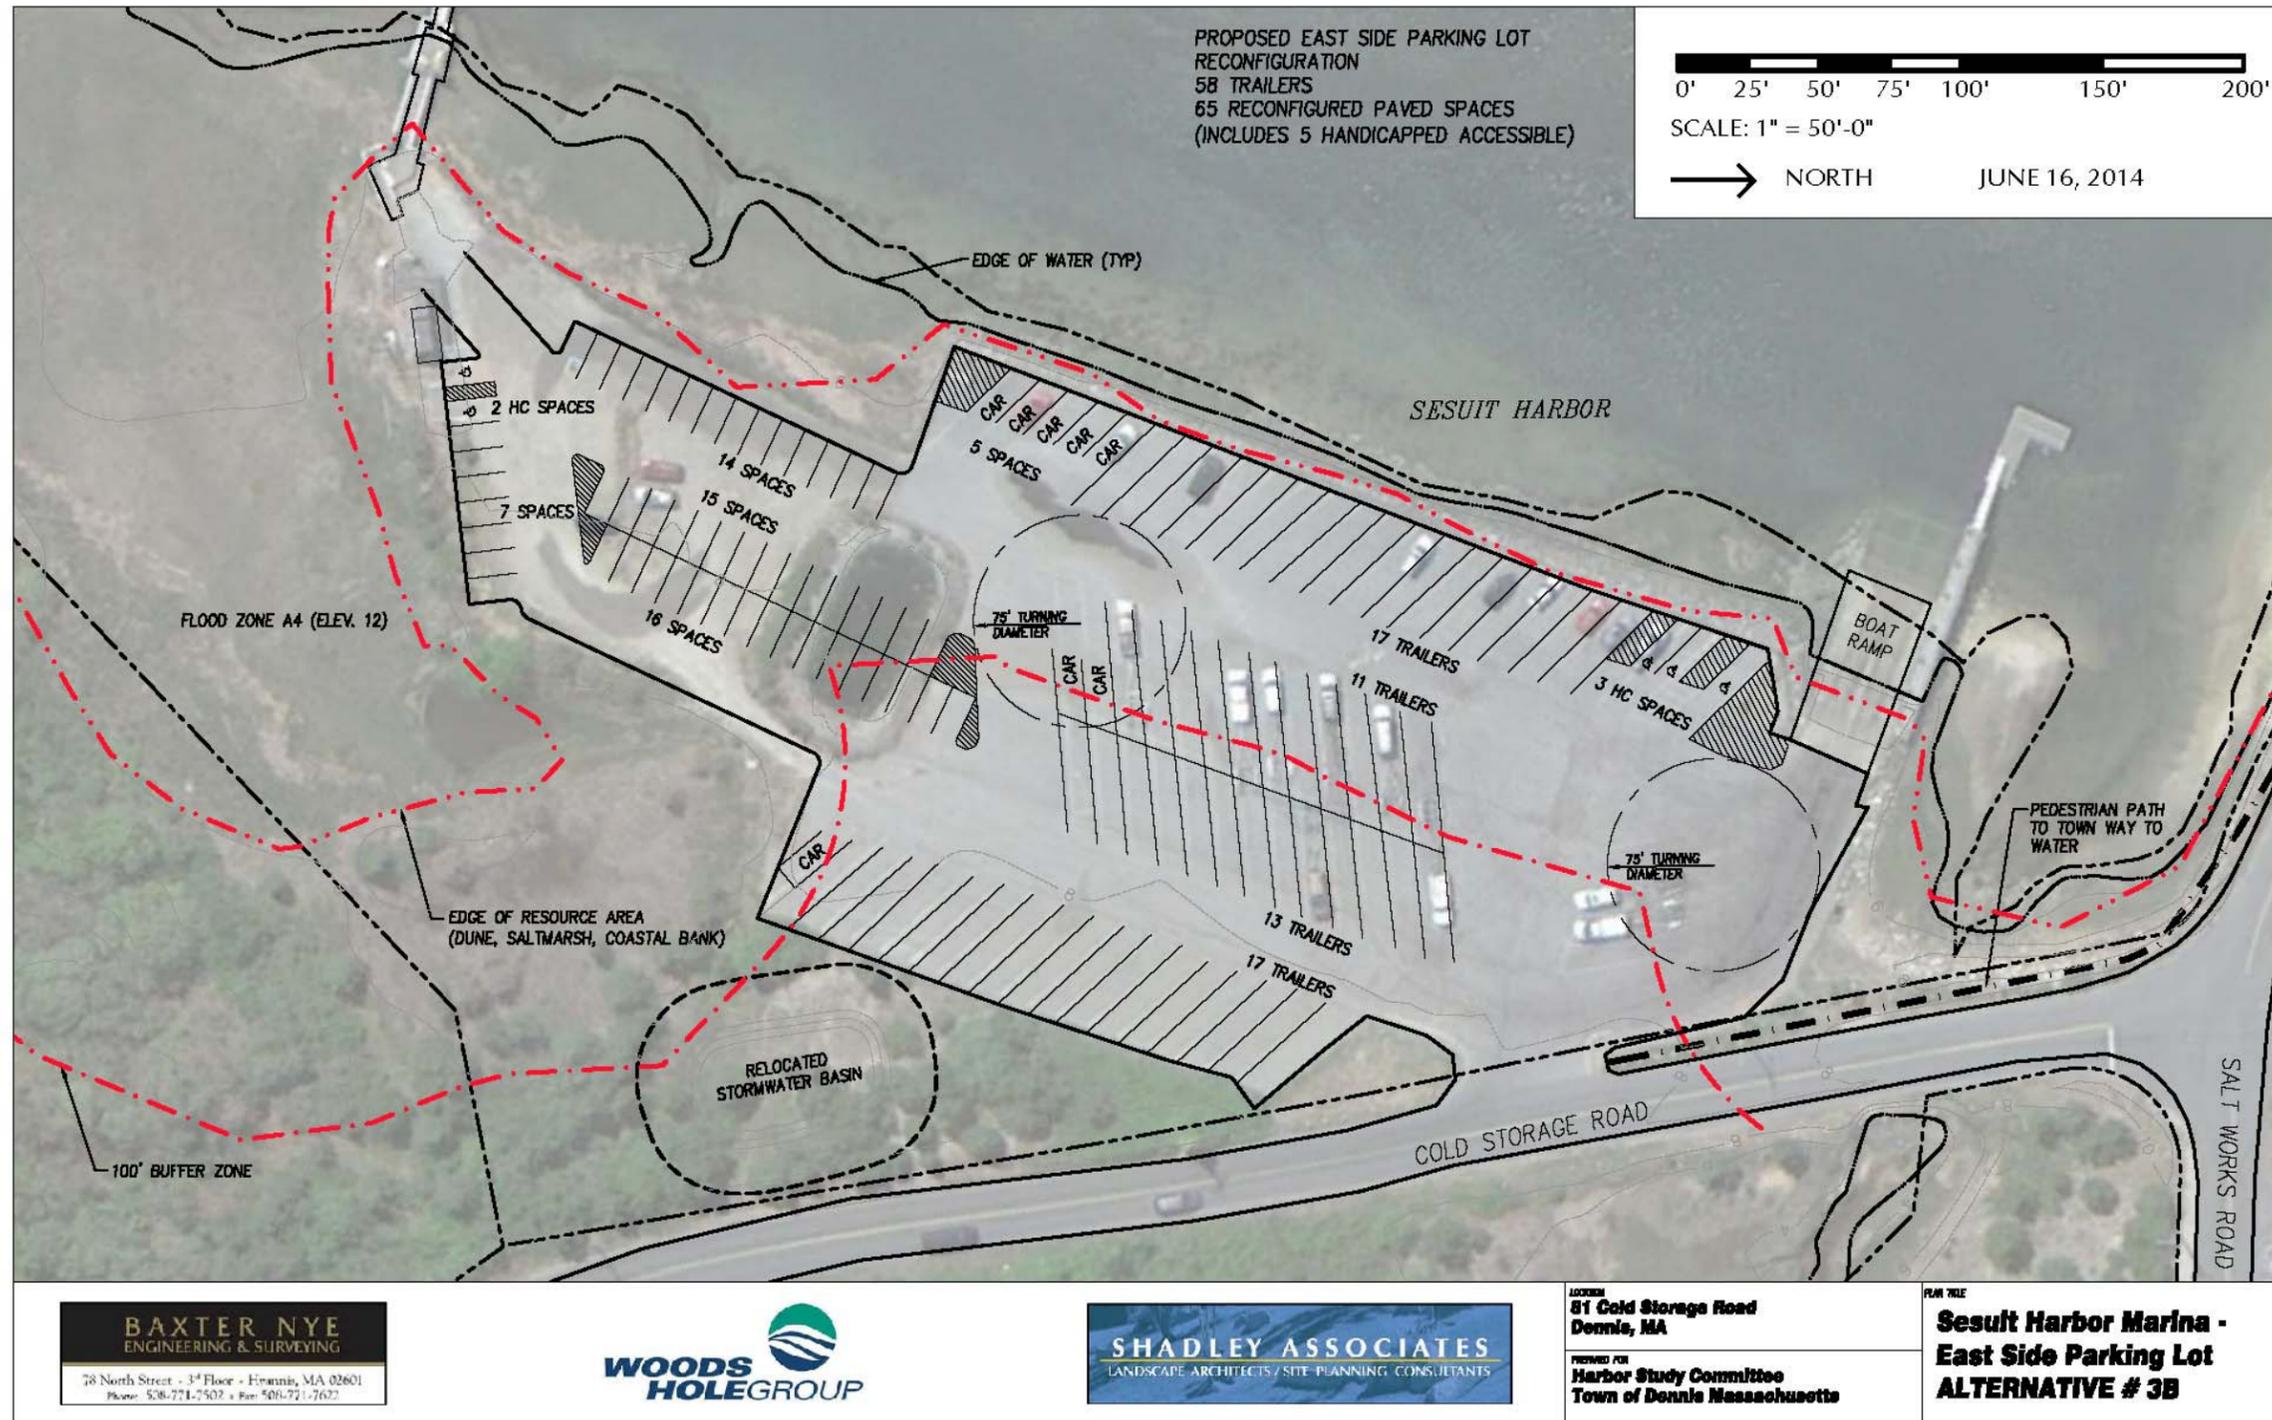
Recommended East Side Site Improvements – Alternative 3B
